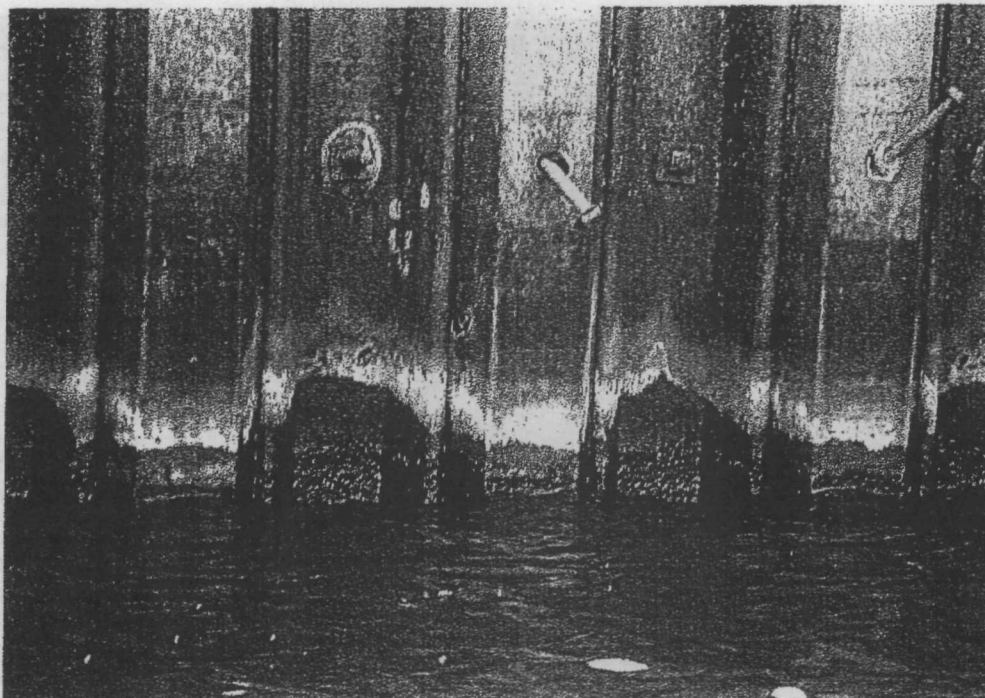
View of Failed Sheet at Station 2+80, Looking North.
